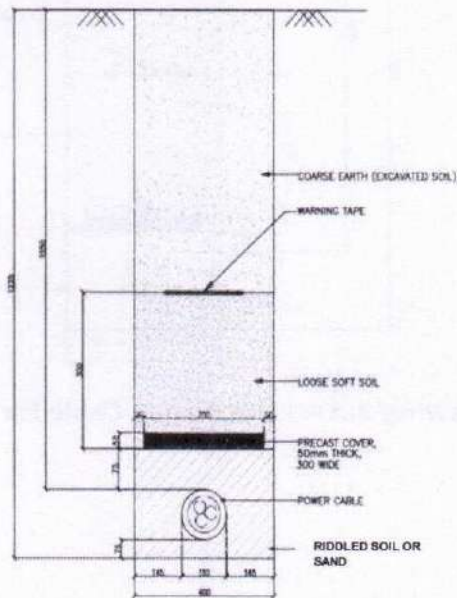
11kV Buried Cable for Single Circuit
